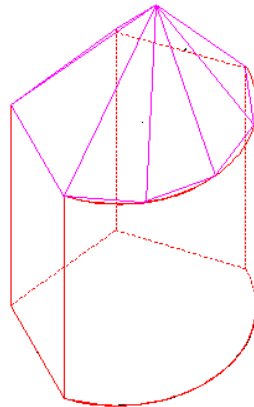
Author's form of an energy efficient house with a seven-line roof and an arch wall
